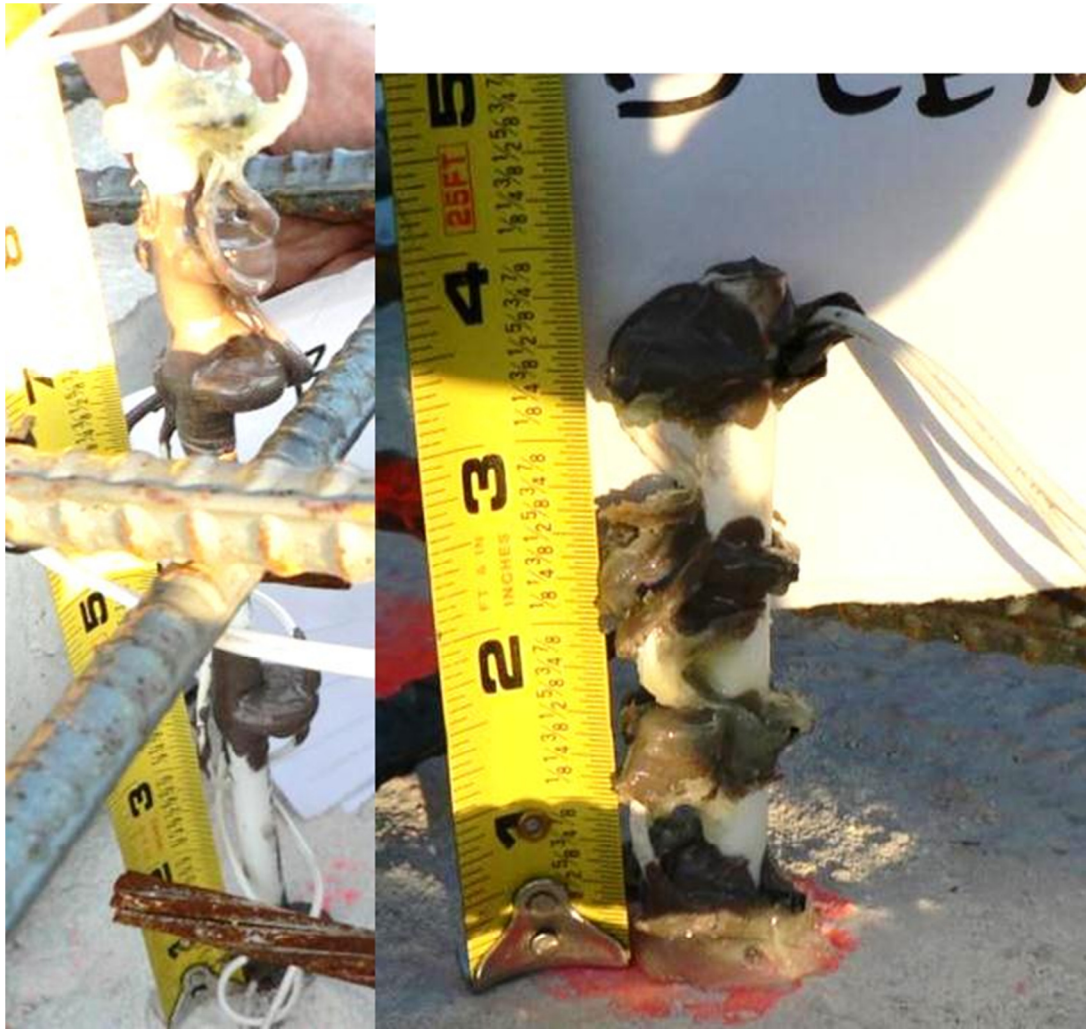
iButton strings on Georgetown bridge deck summer pour.
